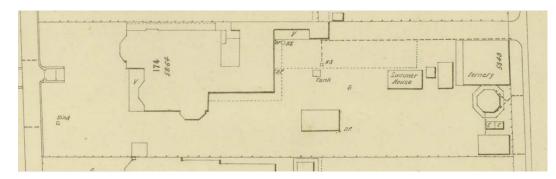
Layout from MMBW Detail Plan no. 962, dated 1896 (source: SLV).
